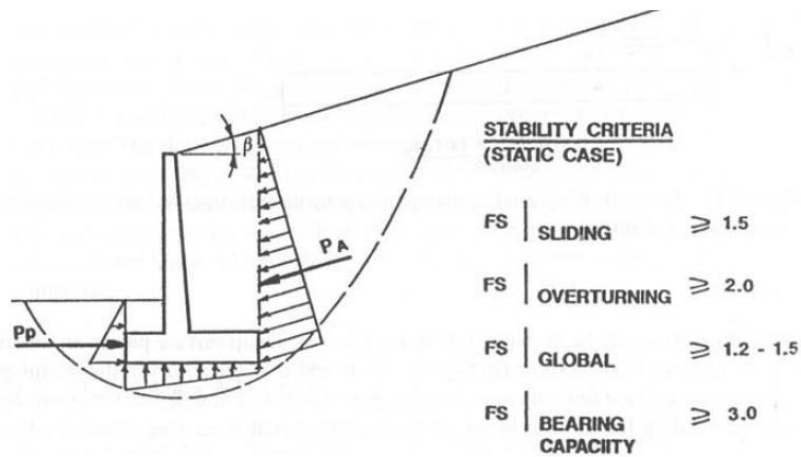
Conventional gravity or cantilever retaining wall (Abramson et al., 2002).
